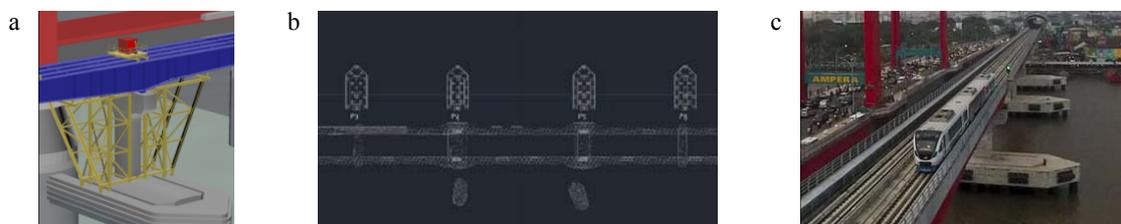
Palembang LRT cross Musi river, Indonesia: a – modelling pier studies, b – plan view of pier foundation; c – LRT bridge after construction
